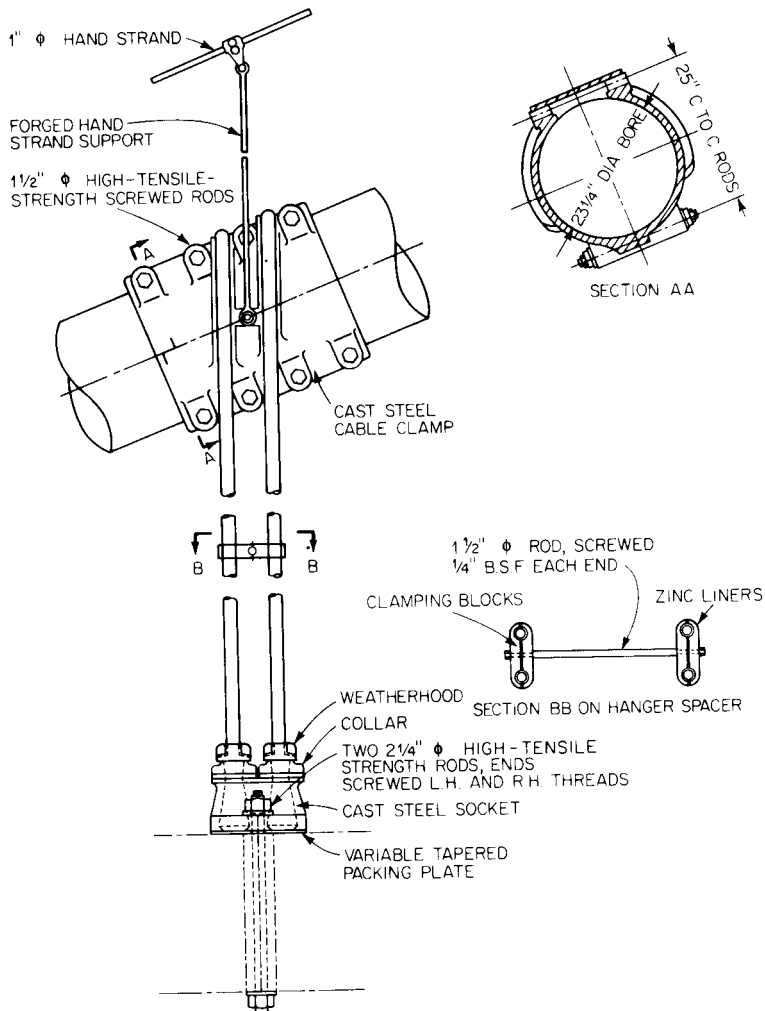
Cable band and suspender detail used for the Forth Road Bridge. (Reprinted with permission from Sire Gilbert Roberts, "Forth Road Bridge," Institution of Civil Engineers, London.)
